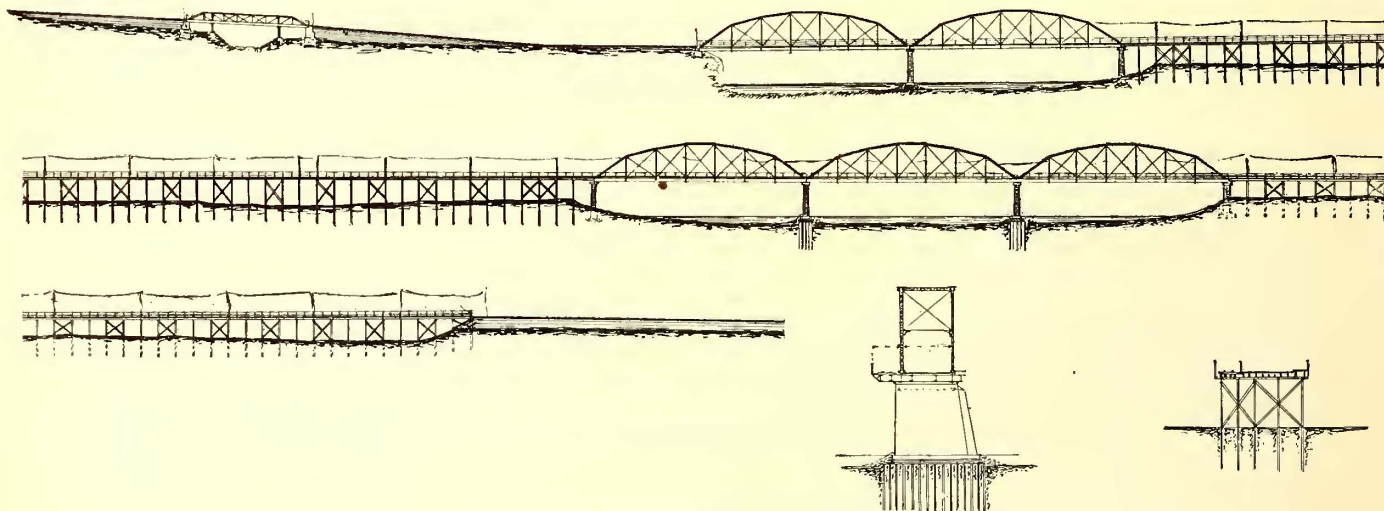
SIDE VIEW AND SECTIONS OF BRIDGE AT PLYMOUTH, BEING BUILT FOR THE WILKESBARRE & WYOMING VALLEY TRACTION CO.
